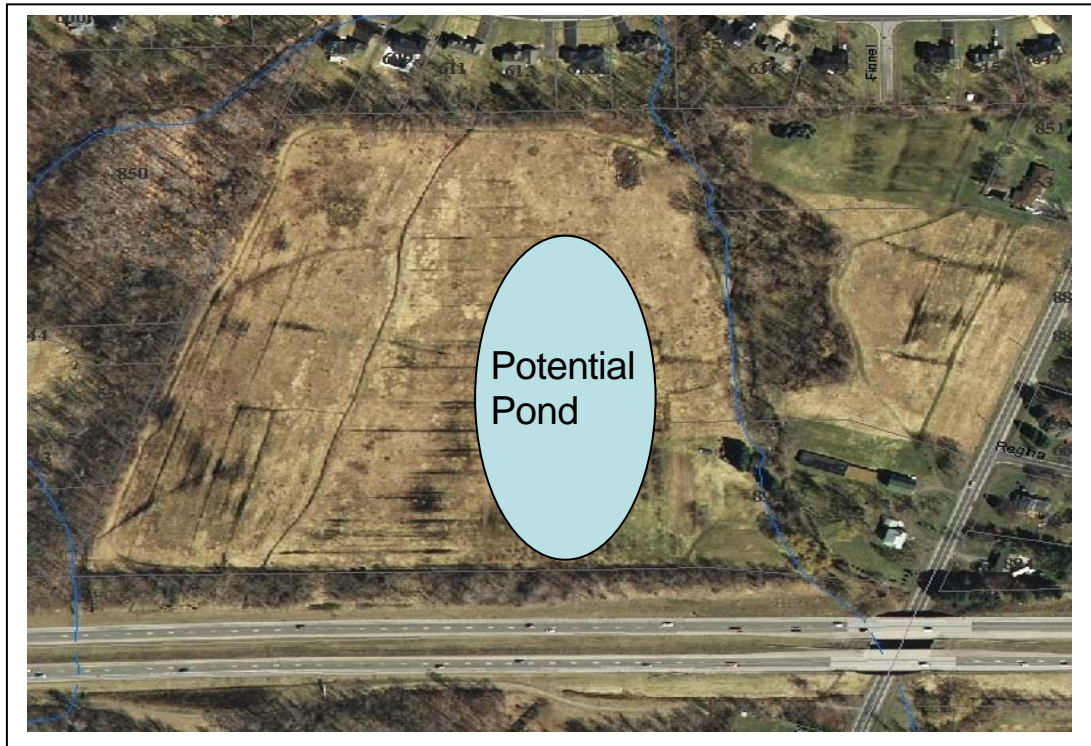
Finn Park in Webster, Potential Site for Stormwater Pond
